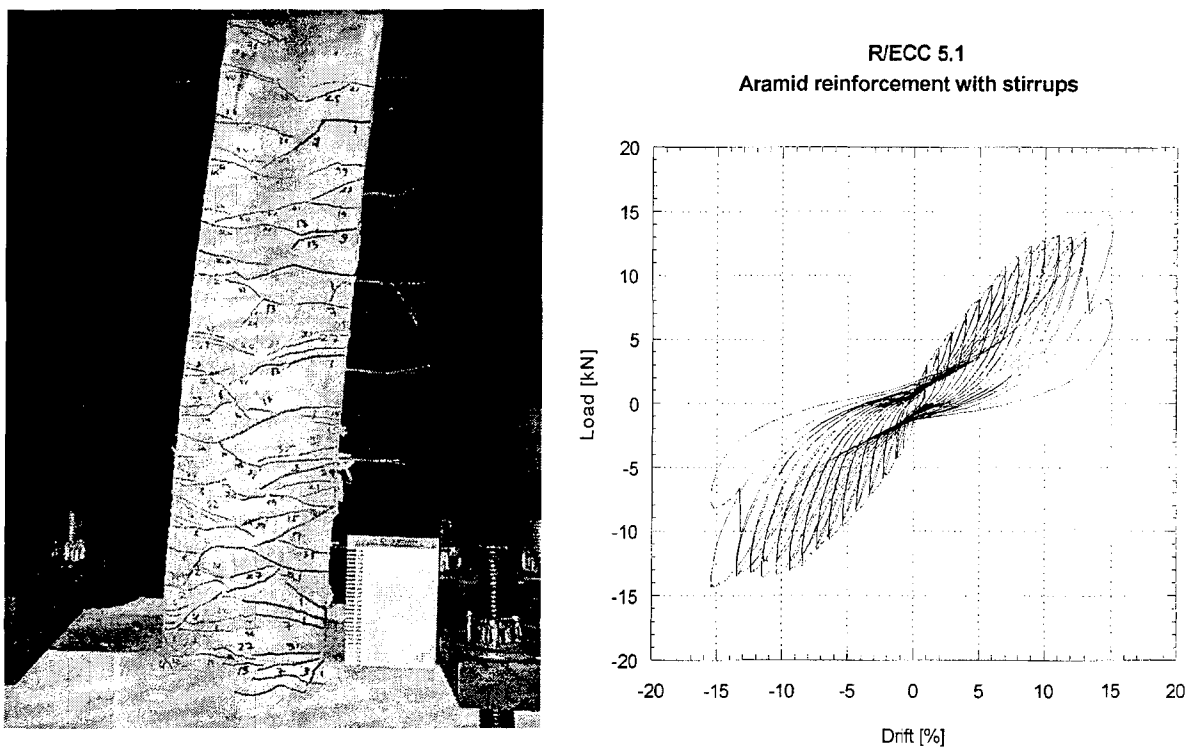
Specimen #2 at 10% drift and load deformation behavior
